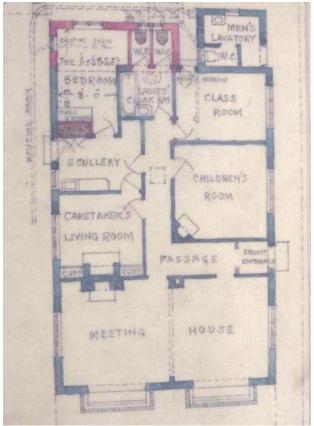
Ground floor plan of proposed extension by J.J. Woods in 1931 (Brotherton Library, Special Collections, MS/DEP/1979/1/PLA/4)
